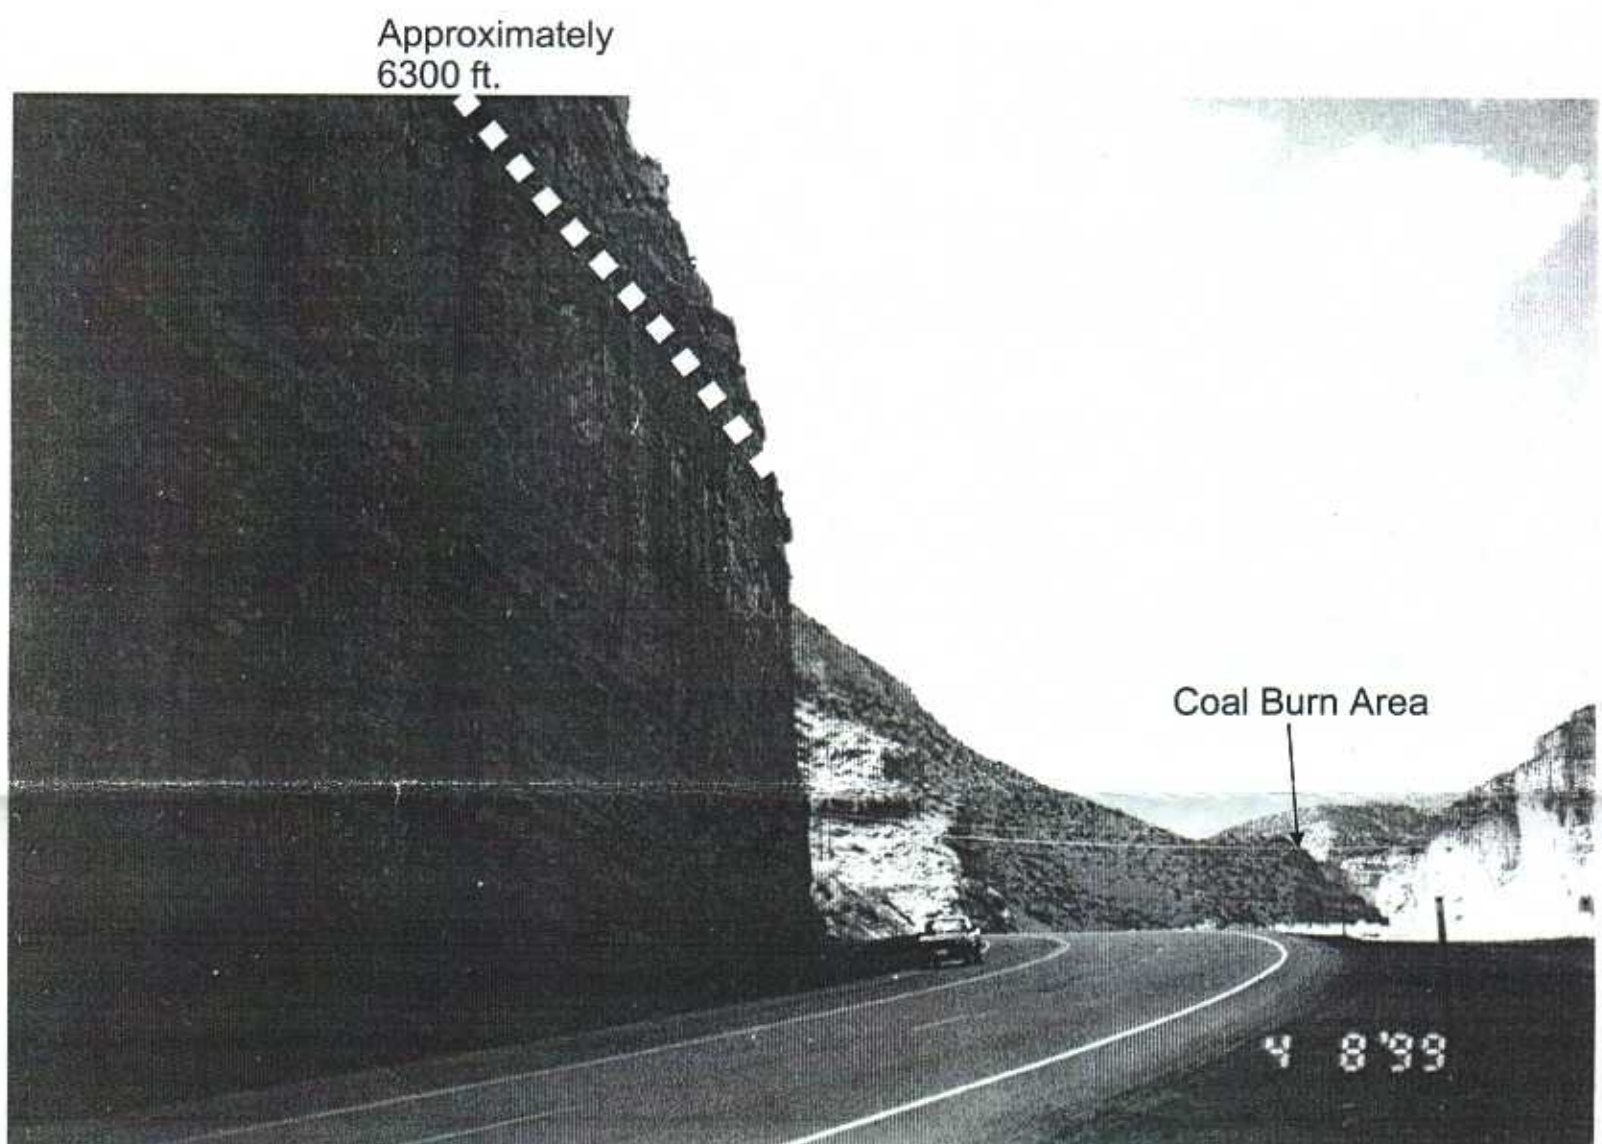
Roadcut on Highway 6 in Price Canyon 1/8 mile northwest of Power Plant near junction of Highway 191 located in Center of the NW ¼, Sec. 1, T13S, R9E.
